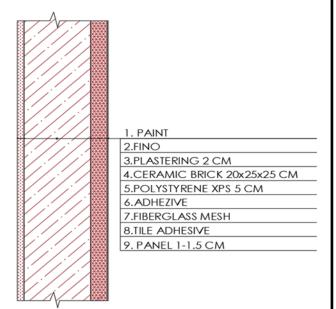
Building A masonry composition, CAD, Source: Authors.
